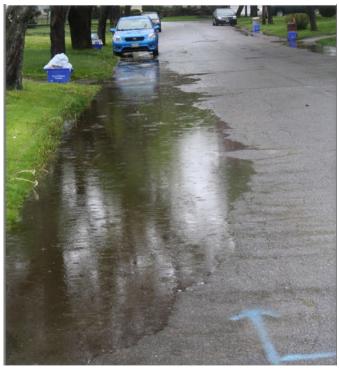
Project Purpose – Address poor drainage on and around the properties (including within Winding Way)
